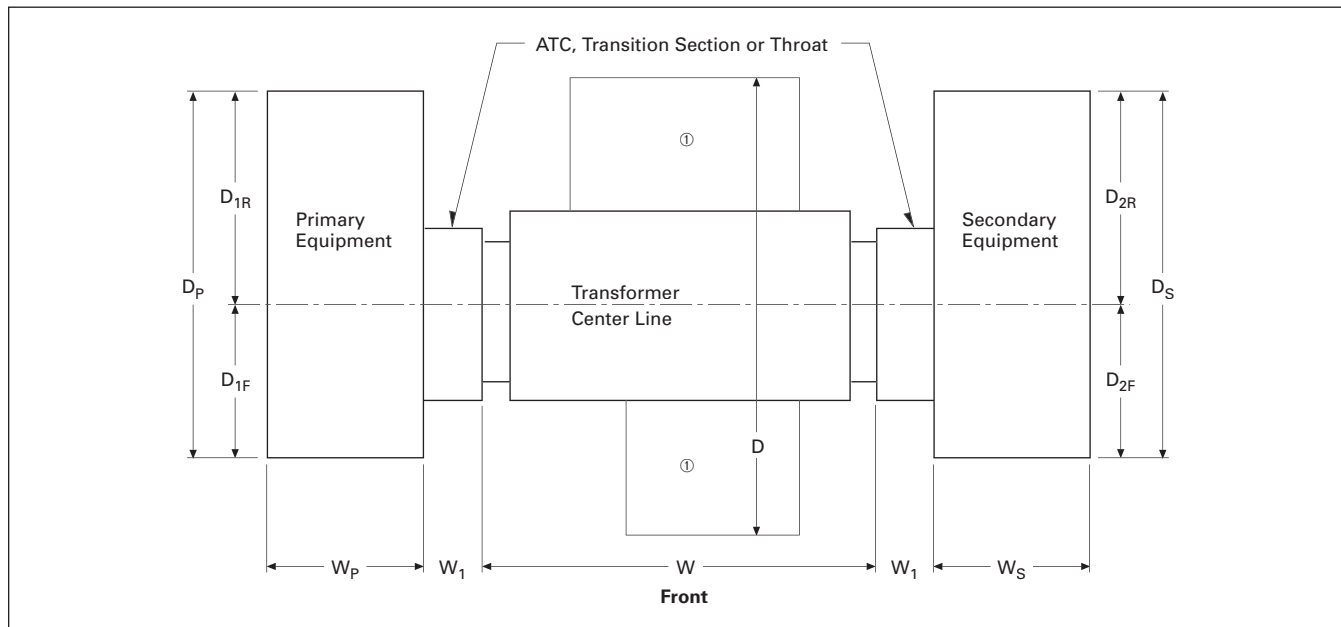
Outdoor Liquid-Filled Primary Unit Substations — Plan View
